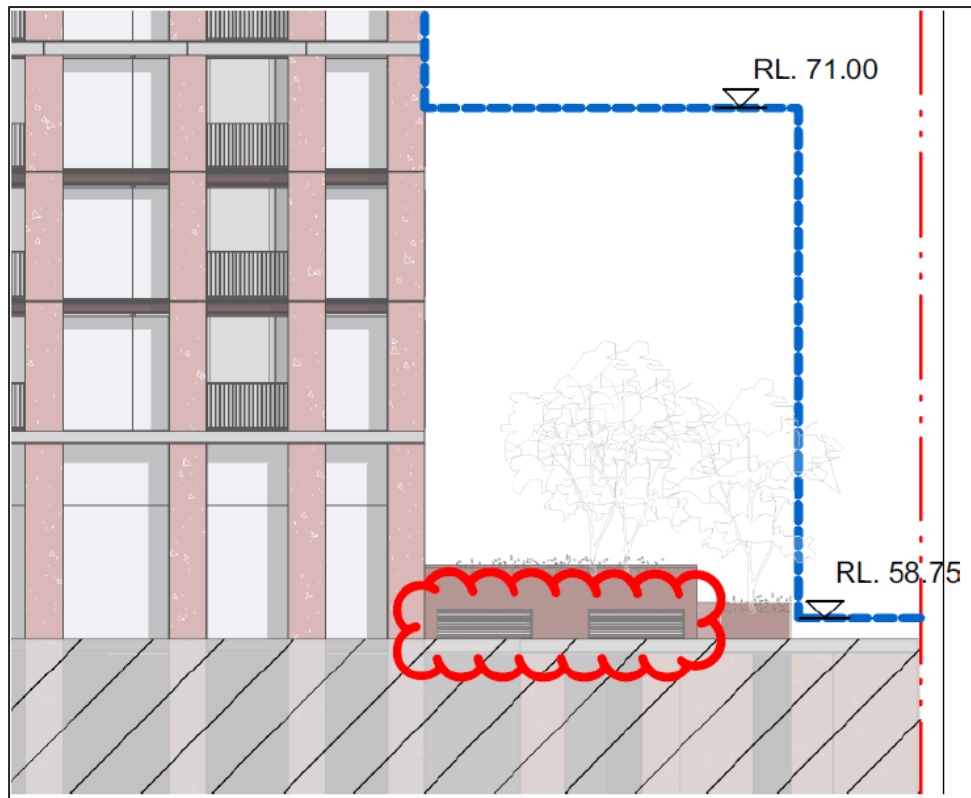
| Proposed relocated louvres on level 6 (Source: Applicant's modification report)
